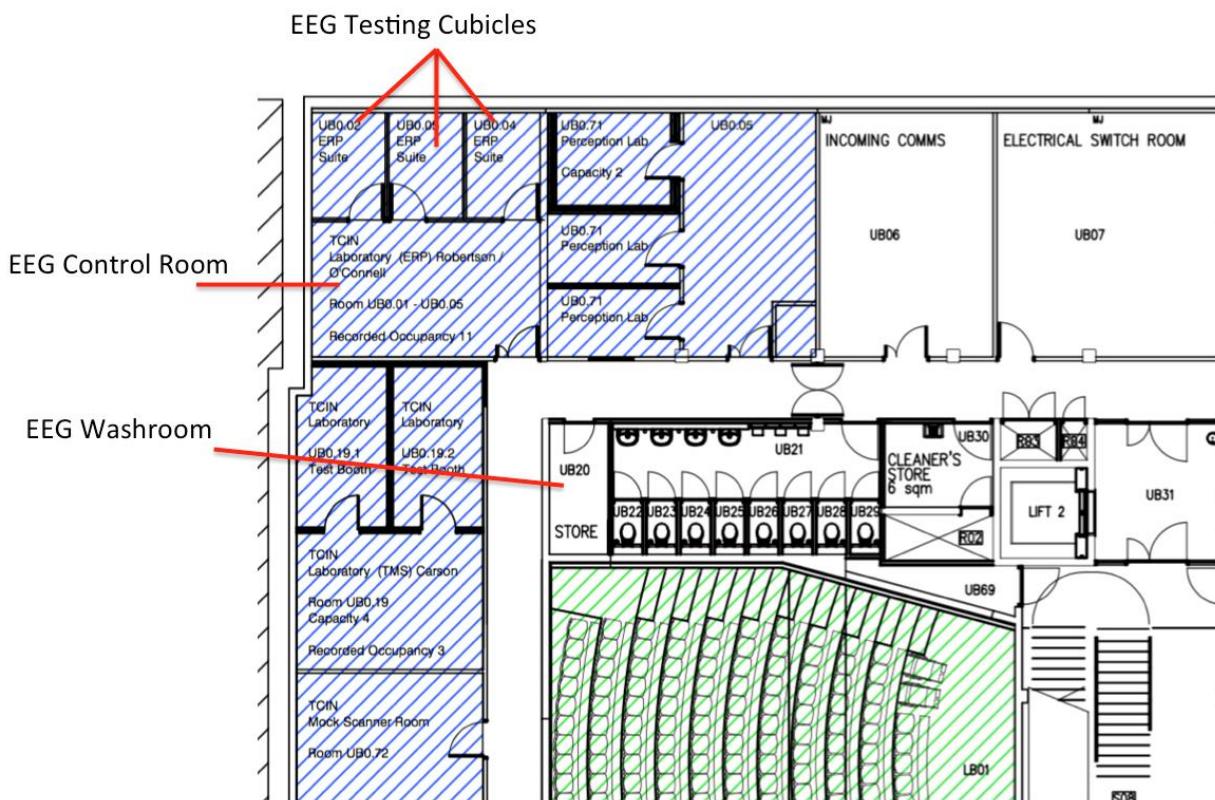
Floor Plan of EEG Facility in the Lloyd Building
